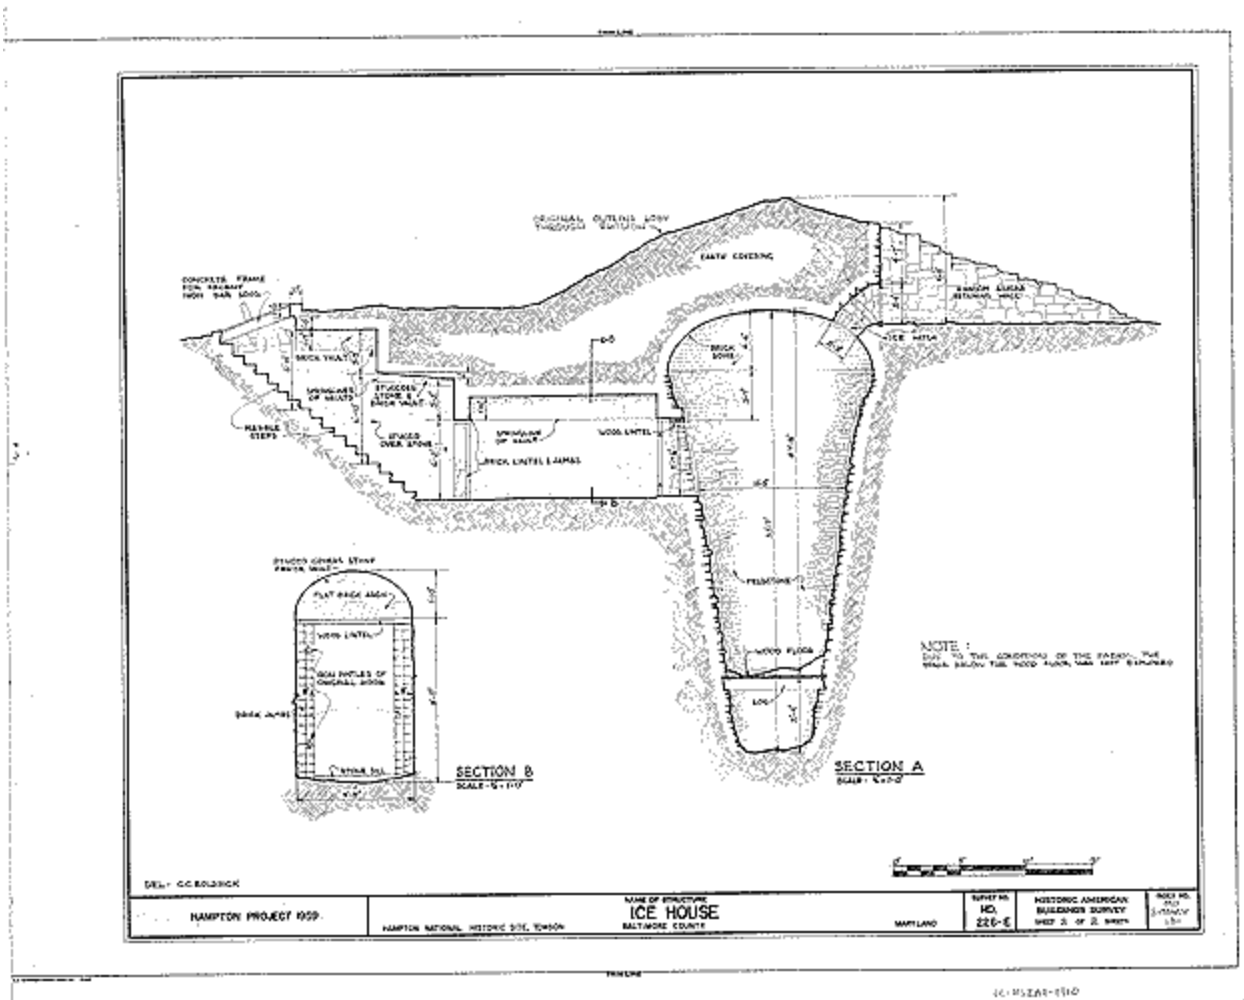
Hampton Plantation Ice House. Baltimore, Maryland. Blueprint of the ice house built between 1783 and 1790, courtesy of HABS.
